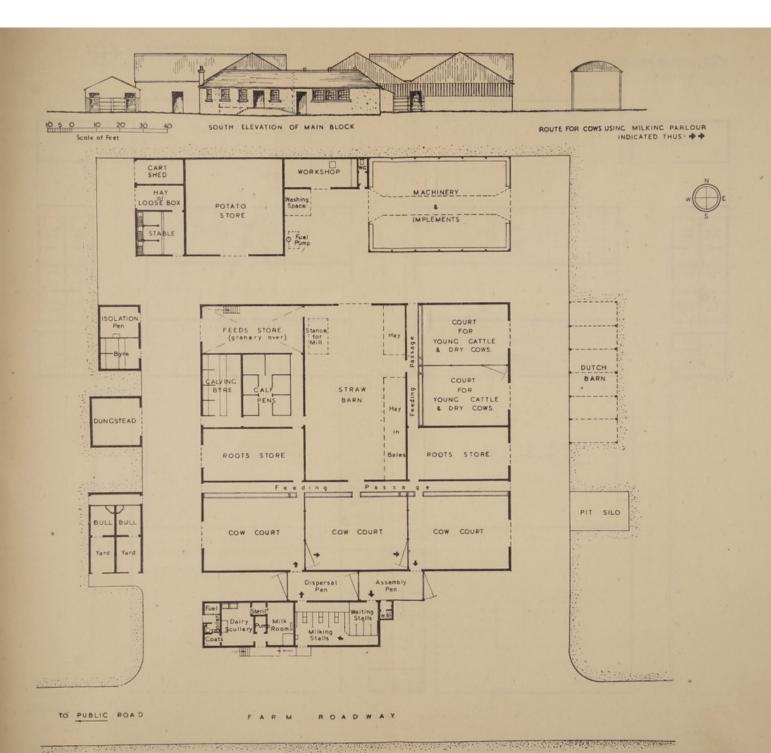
Plan H. Steading for Mixed Arable and Dairy Farm (Cow Court System) for 200 to 250 Acres (See paragraph 58)
